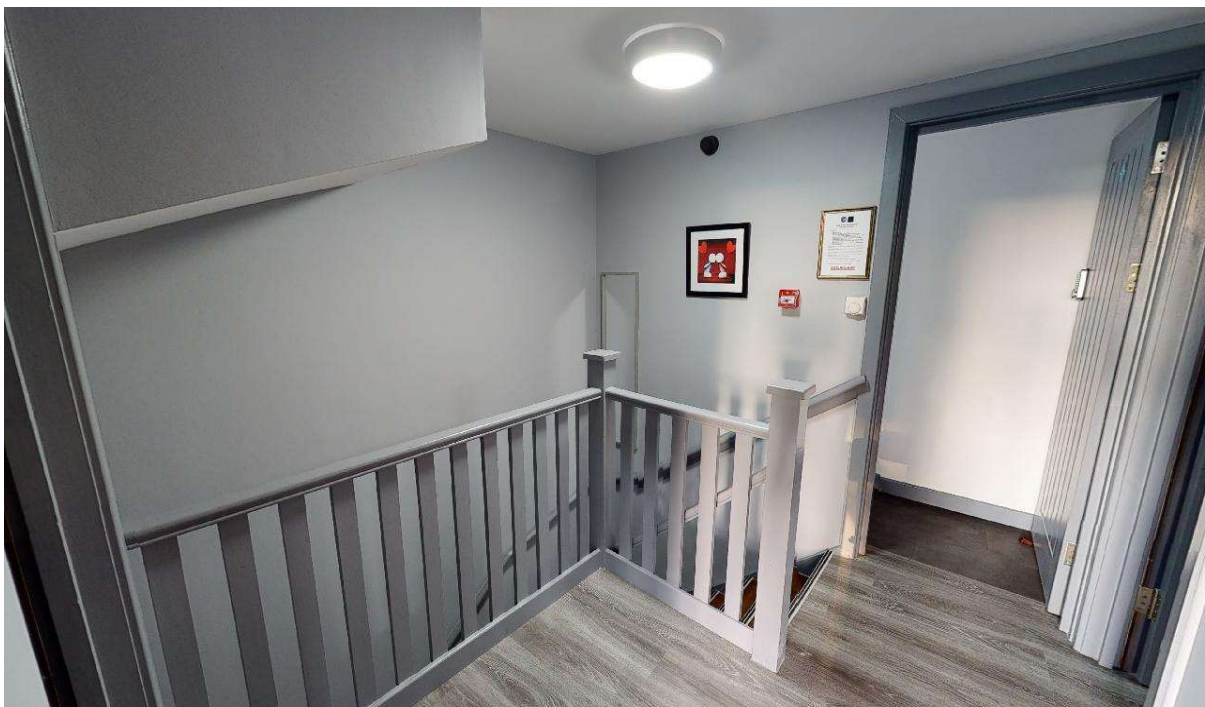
Shows the proposed HMO communal hallway to be constructed to the same standard
